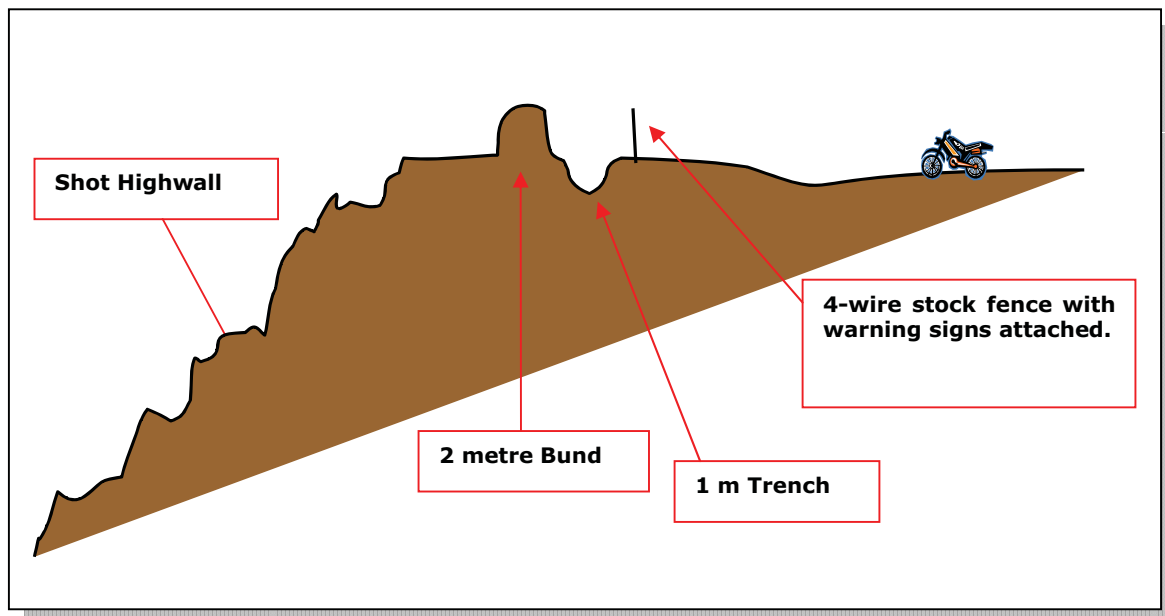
General arrangement for High wall / End wall safety berm and trench
